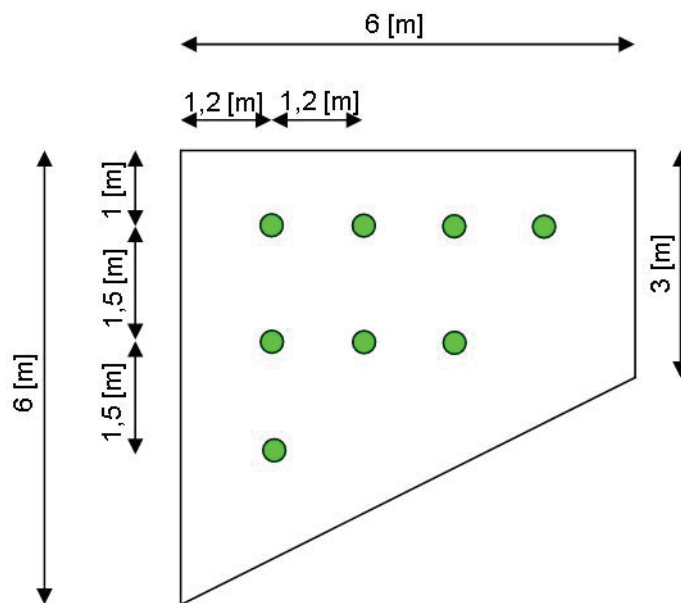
Anchor distribution, special case wedge, wall, plan view, sketch
